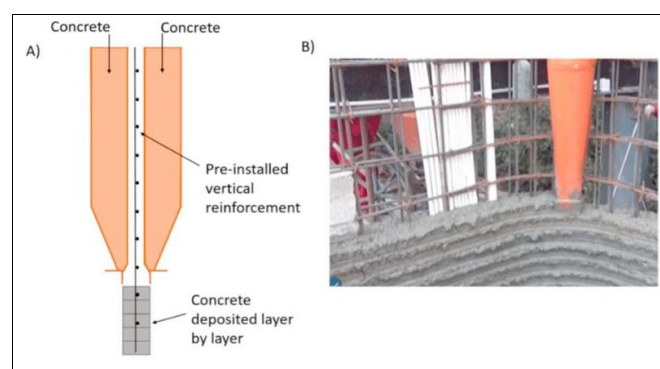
Preinstall reinforcement and 3D concrete printing (Baduge, *et al.*, 2021)
